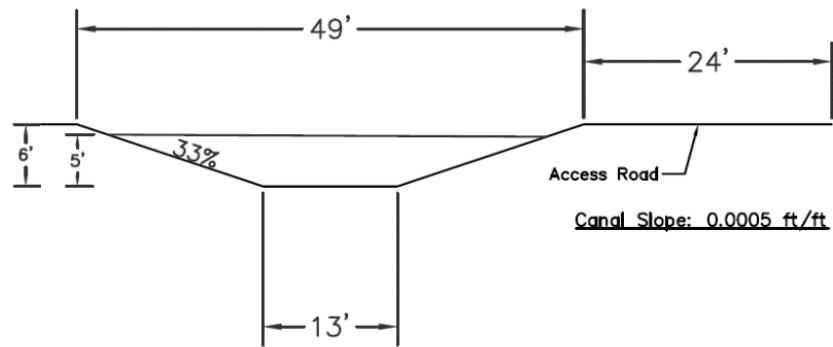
Bypass Canal Cross Section – 500 cfs Capacity
